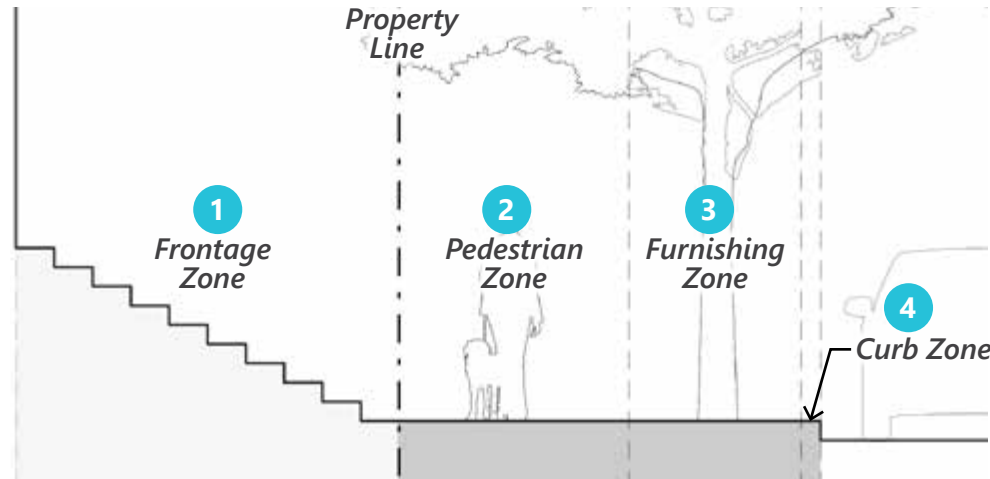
Sidewalk/Parkway along a Multi-Family Residential Street.
